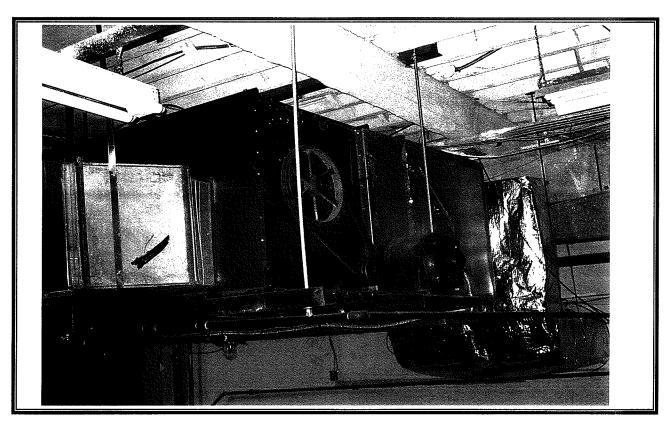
Photo Date 12/05/06 B. Forman Building40+ years old air handling unit suspended from the ceiling
